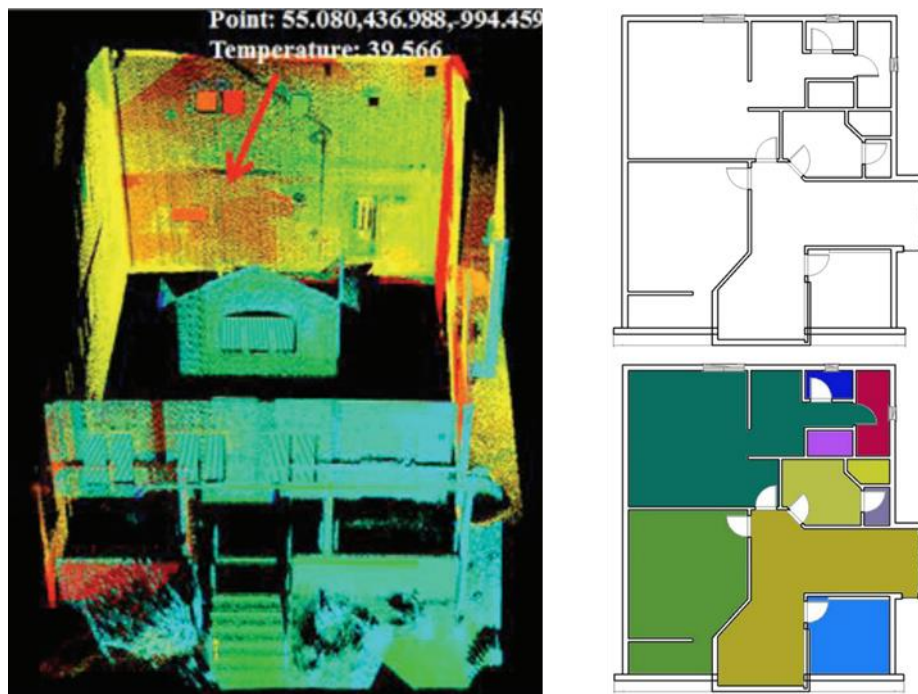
(left) 3D thermal Point Cloud [81], (right) Original floor plan vs room zone segmented floor plan [98]
